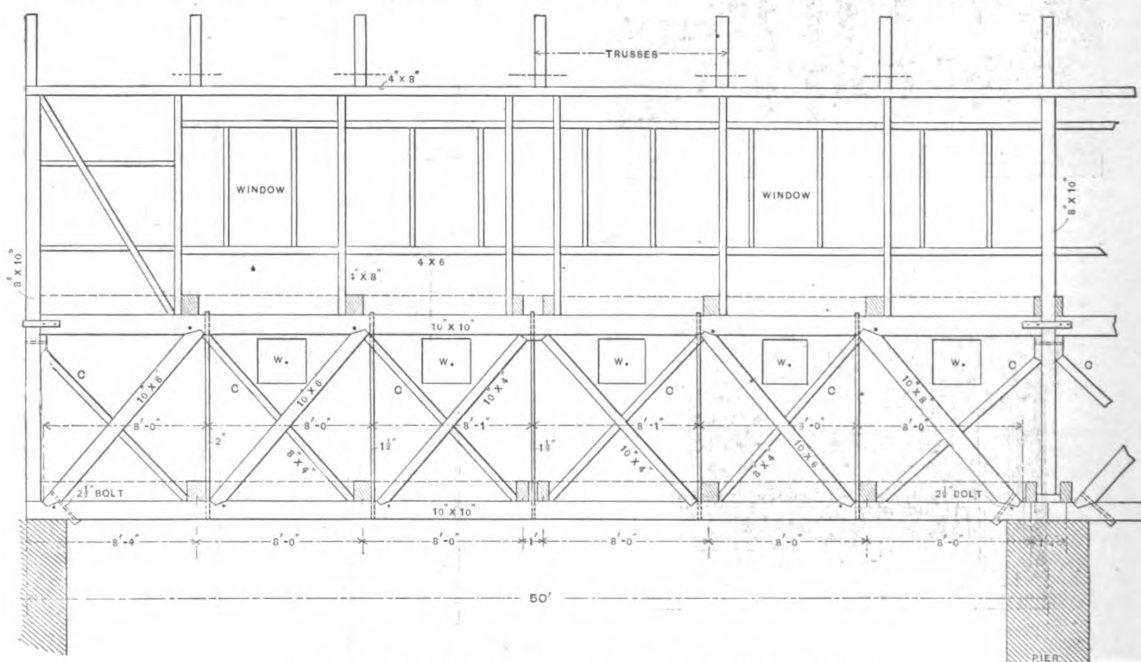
One-half Side Elevation of Building.—Scale, $\frac{1}{4}$ Inch to the Foot.
